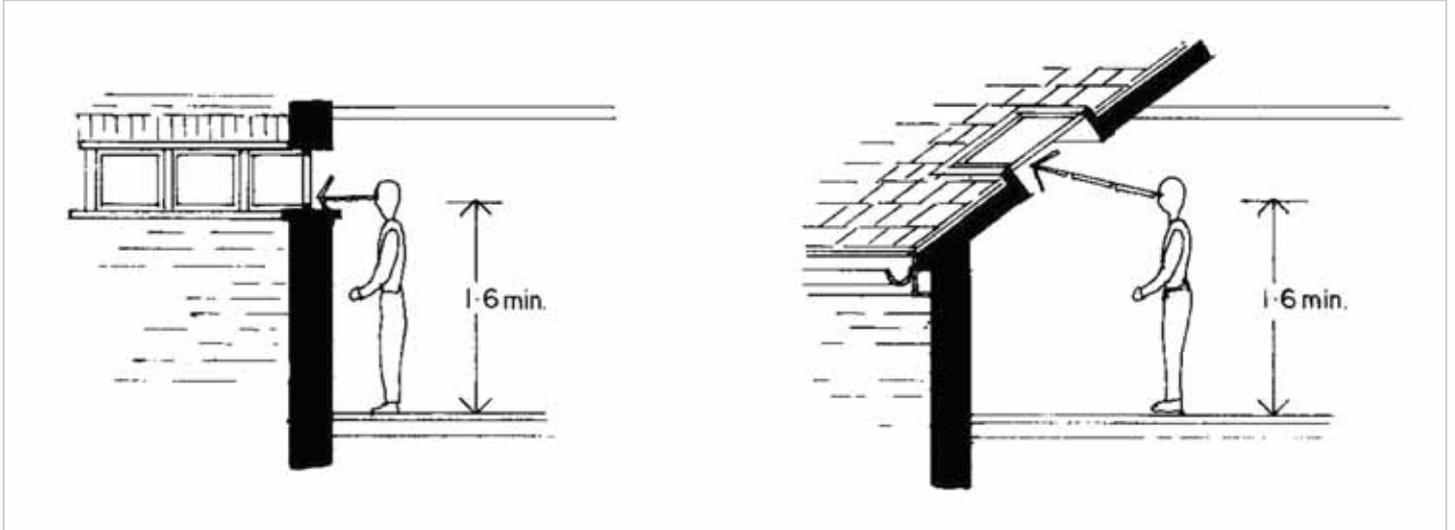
High level windows and roof lights can restrict overlooking of adjacent dwellings.
